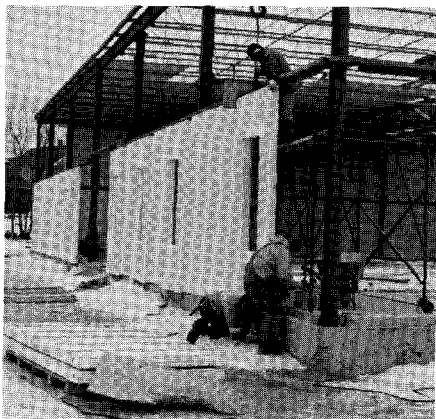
5 x 10-ft insulated panels used to construct walls and roof of a manufacturing warehouse and office building in Bridgeport, Connecticut.
